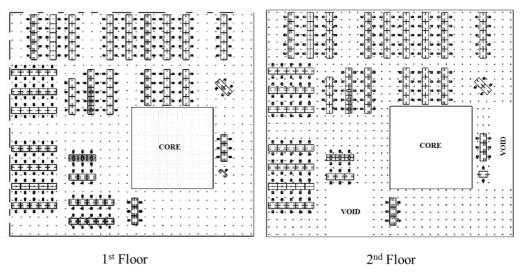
Floor plan of the quadrant of the open plan office design showing the cores and atrium-voids in the floor slab on the 2nd floor which provide the return air path from the 1st floor to the extract points at the core.
